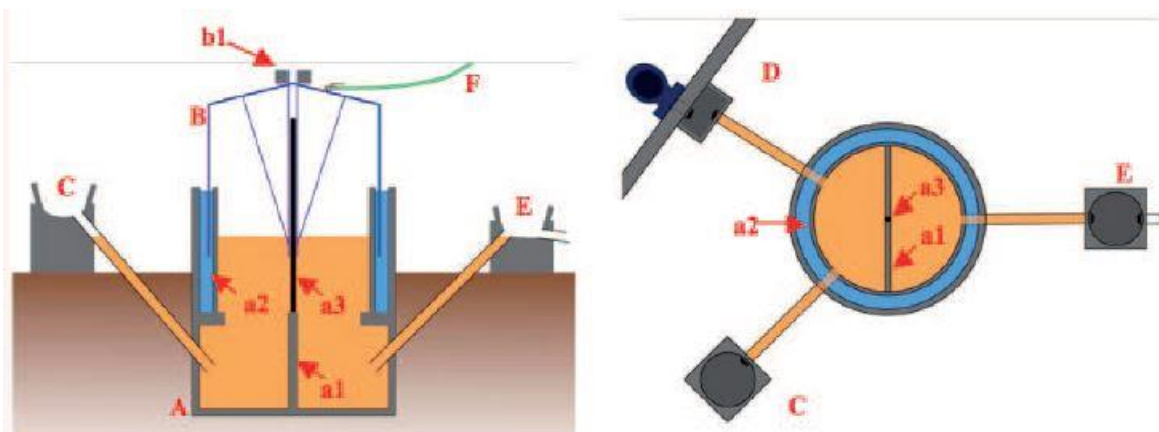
Toilet Linked Biogas Plant: cross section and upper view (Mulleger et al. 2011).
